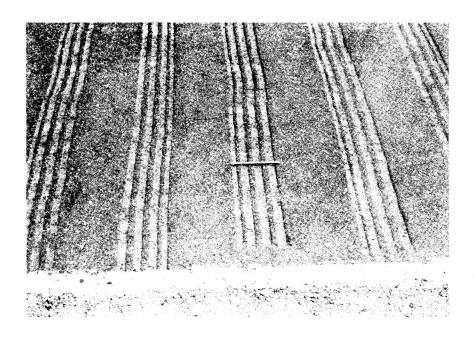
Close view of rumble strips cut into passing lane of Route 29.
